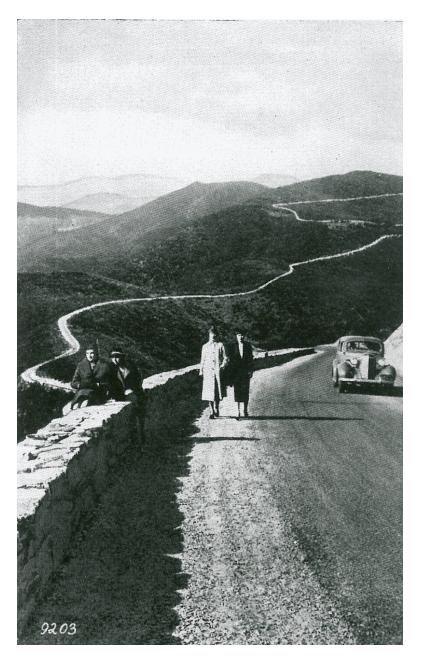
View of drylaid stone retaining wall north of Mary's Tunnel along Skyline Drive, installed in 1930-31 (Engle, 2006:73).
